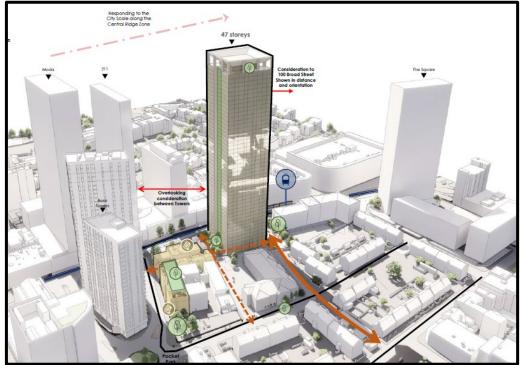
Massing visual showing existing and consented tower at 211 (note 100 not shown)
